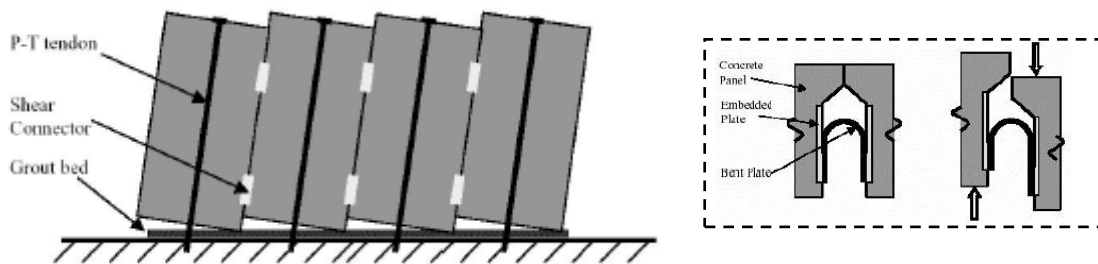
(a) Post Tensioned Rocking Wall System, (b) Detail of U shaped dissipators [7]
